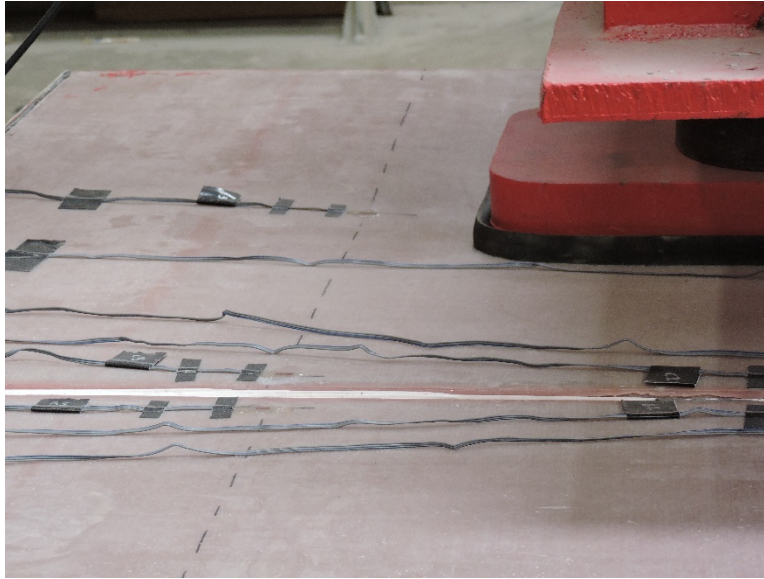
Specimen PTP-1 During Panel-to-Panel Connection Test, 93 kip Load
